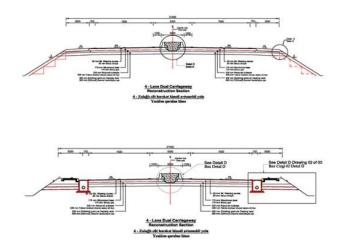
Typical Pavement Cross Sections to identify the structural length adequacy.
